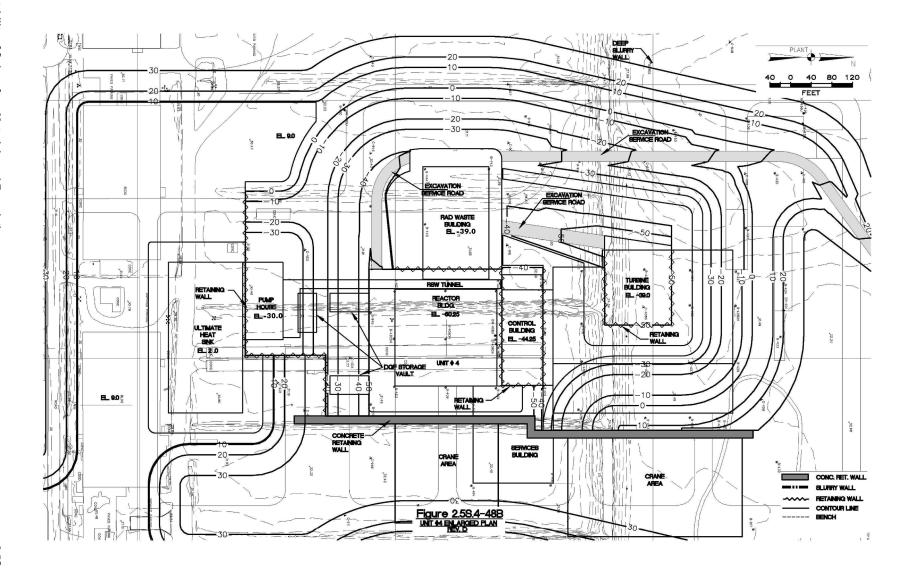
S.4-48B Unit #4 Enlarged Plan Rev. D
